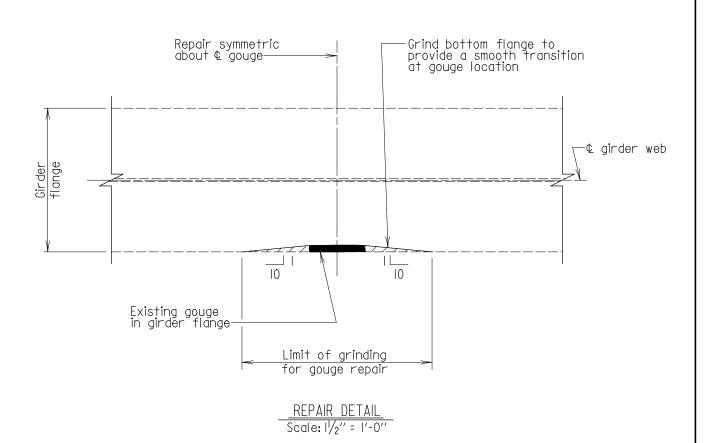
DETAIL NO. SR-ST(FR)-101 SHEET 2 OF 2
